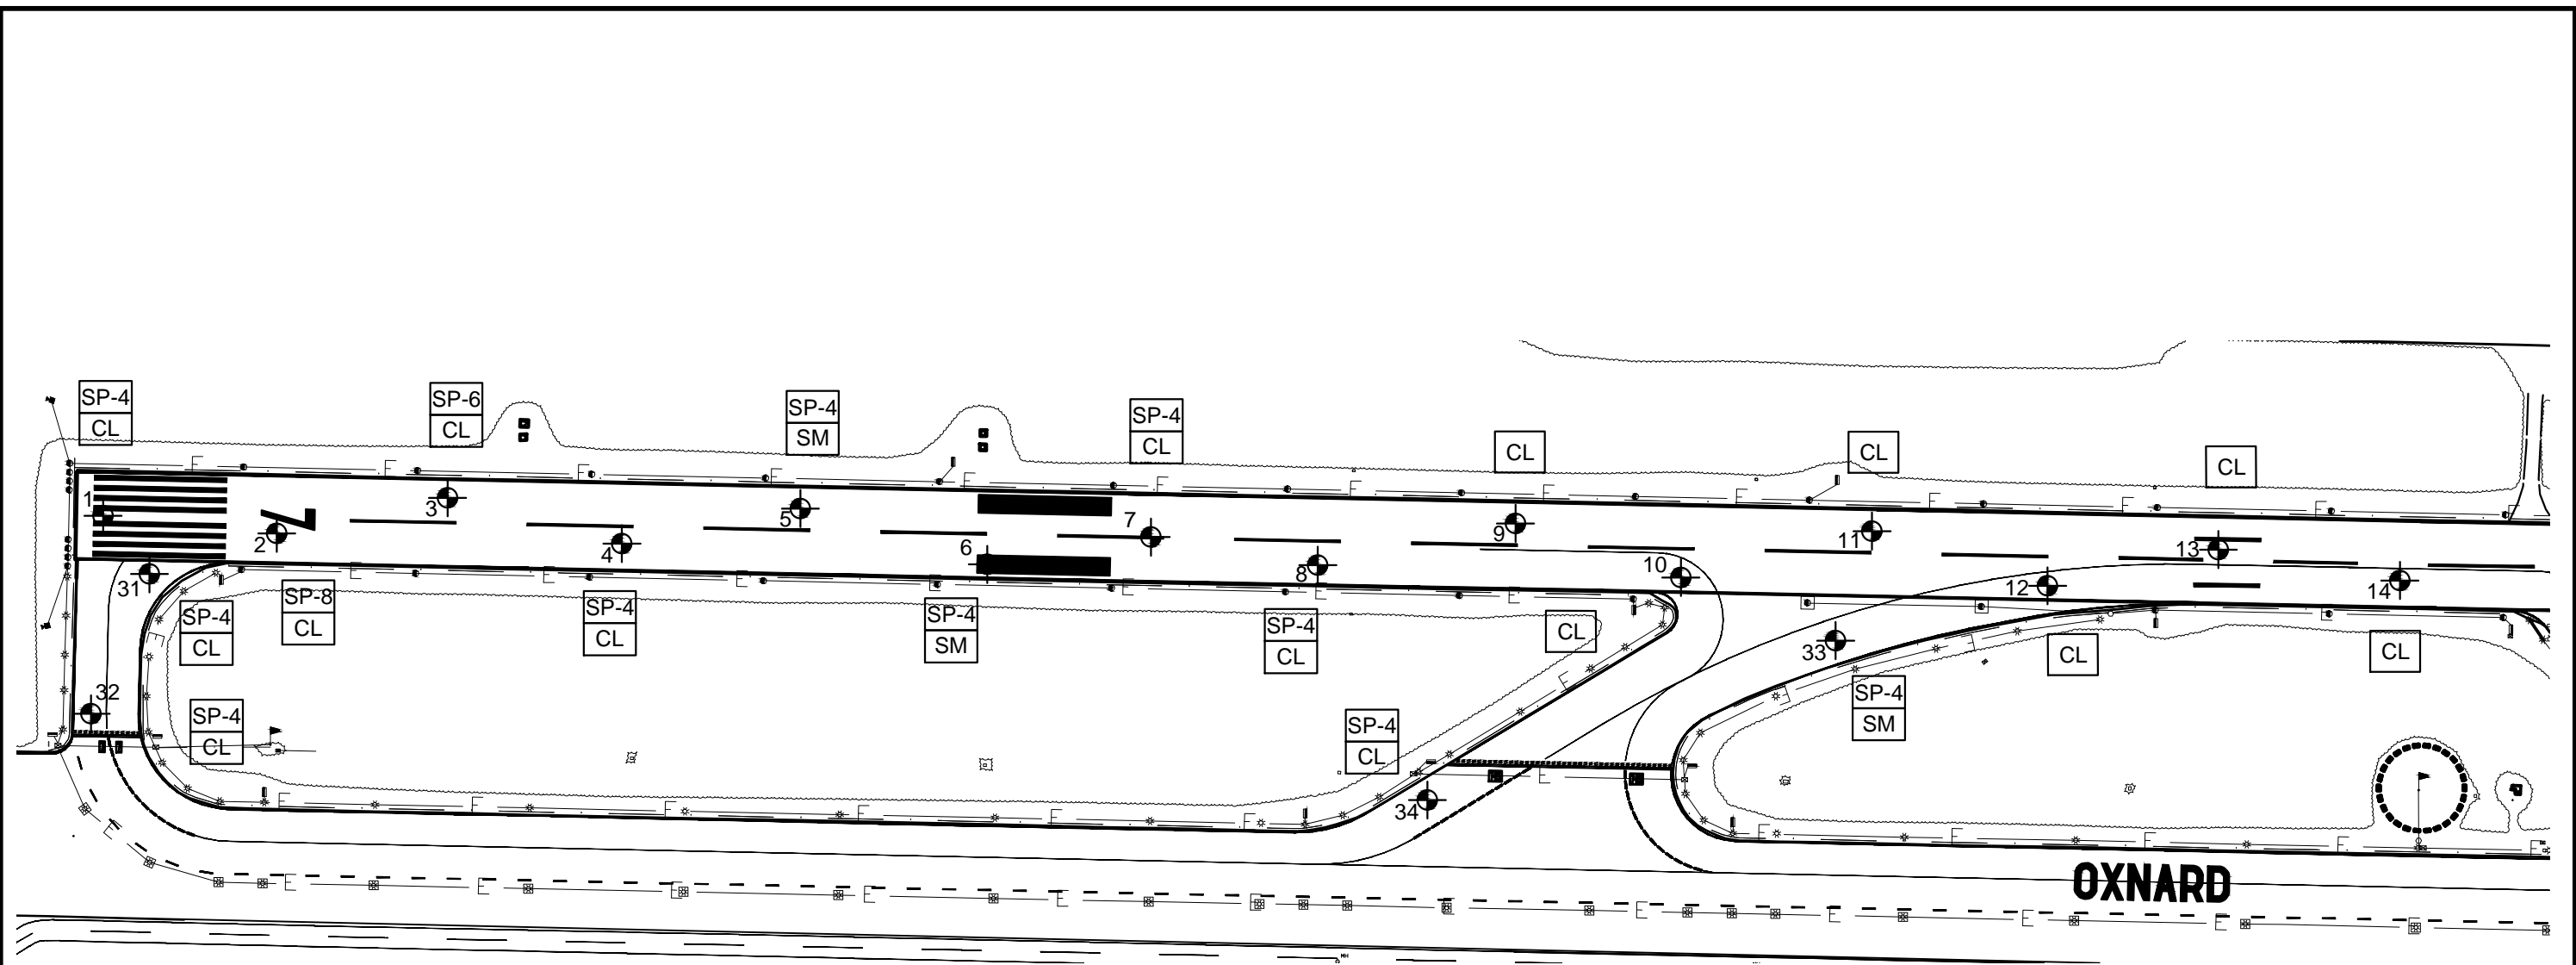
B - EXISTING PAVEMENT SECTION THICKNESSES
